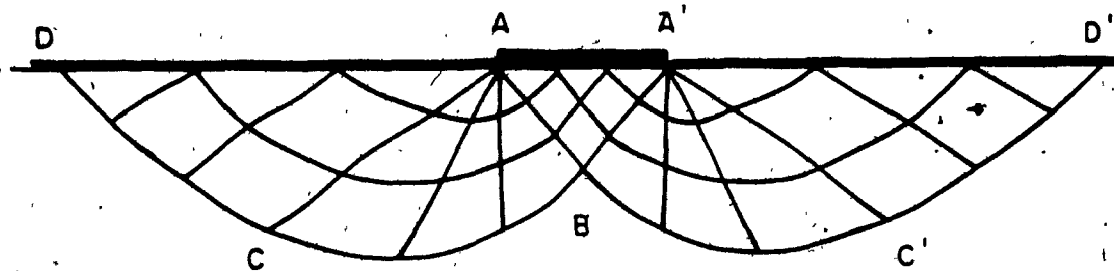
Rupture Surfaces Beneath a Foundation at Failure
